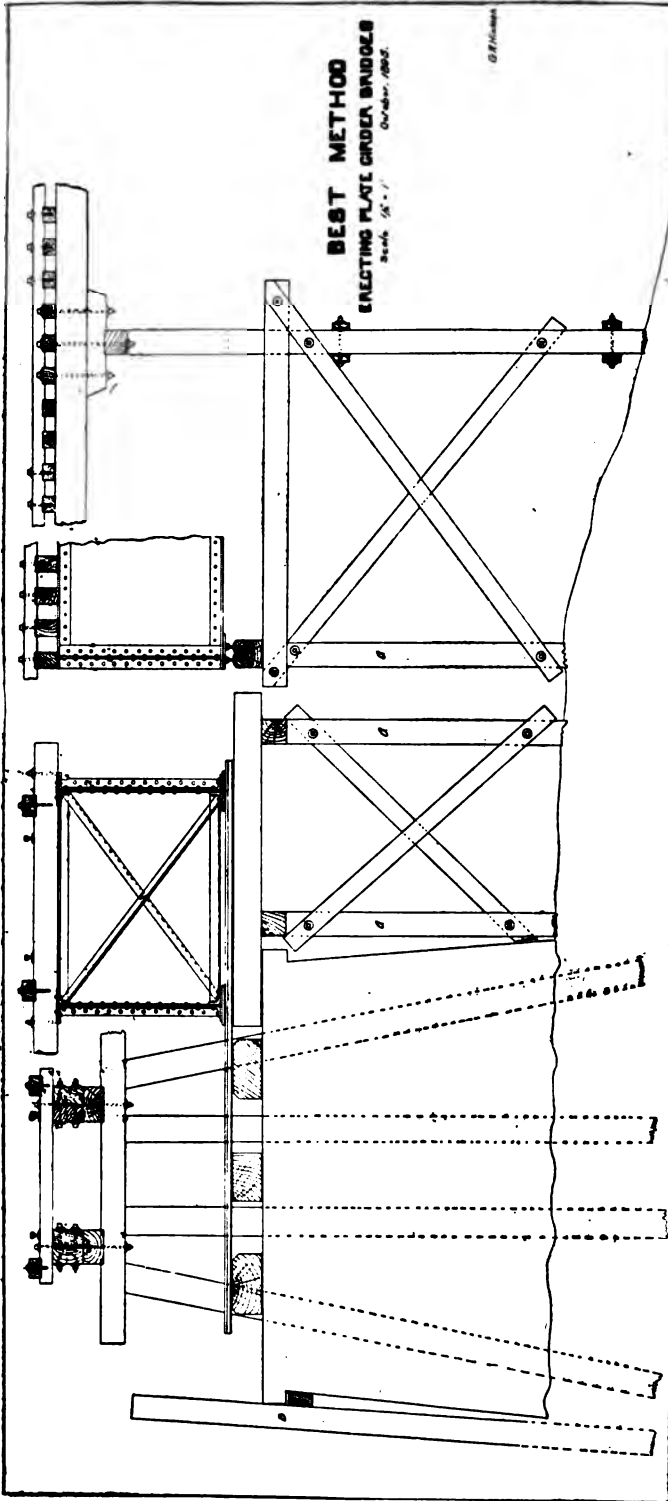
BEST METHOD ERECTING PLATE GIRDER BRIDGES.
